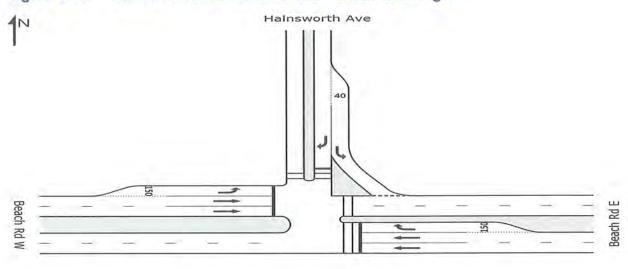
Beach Road/Hainsworth Ave - Existing Design
